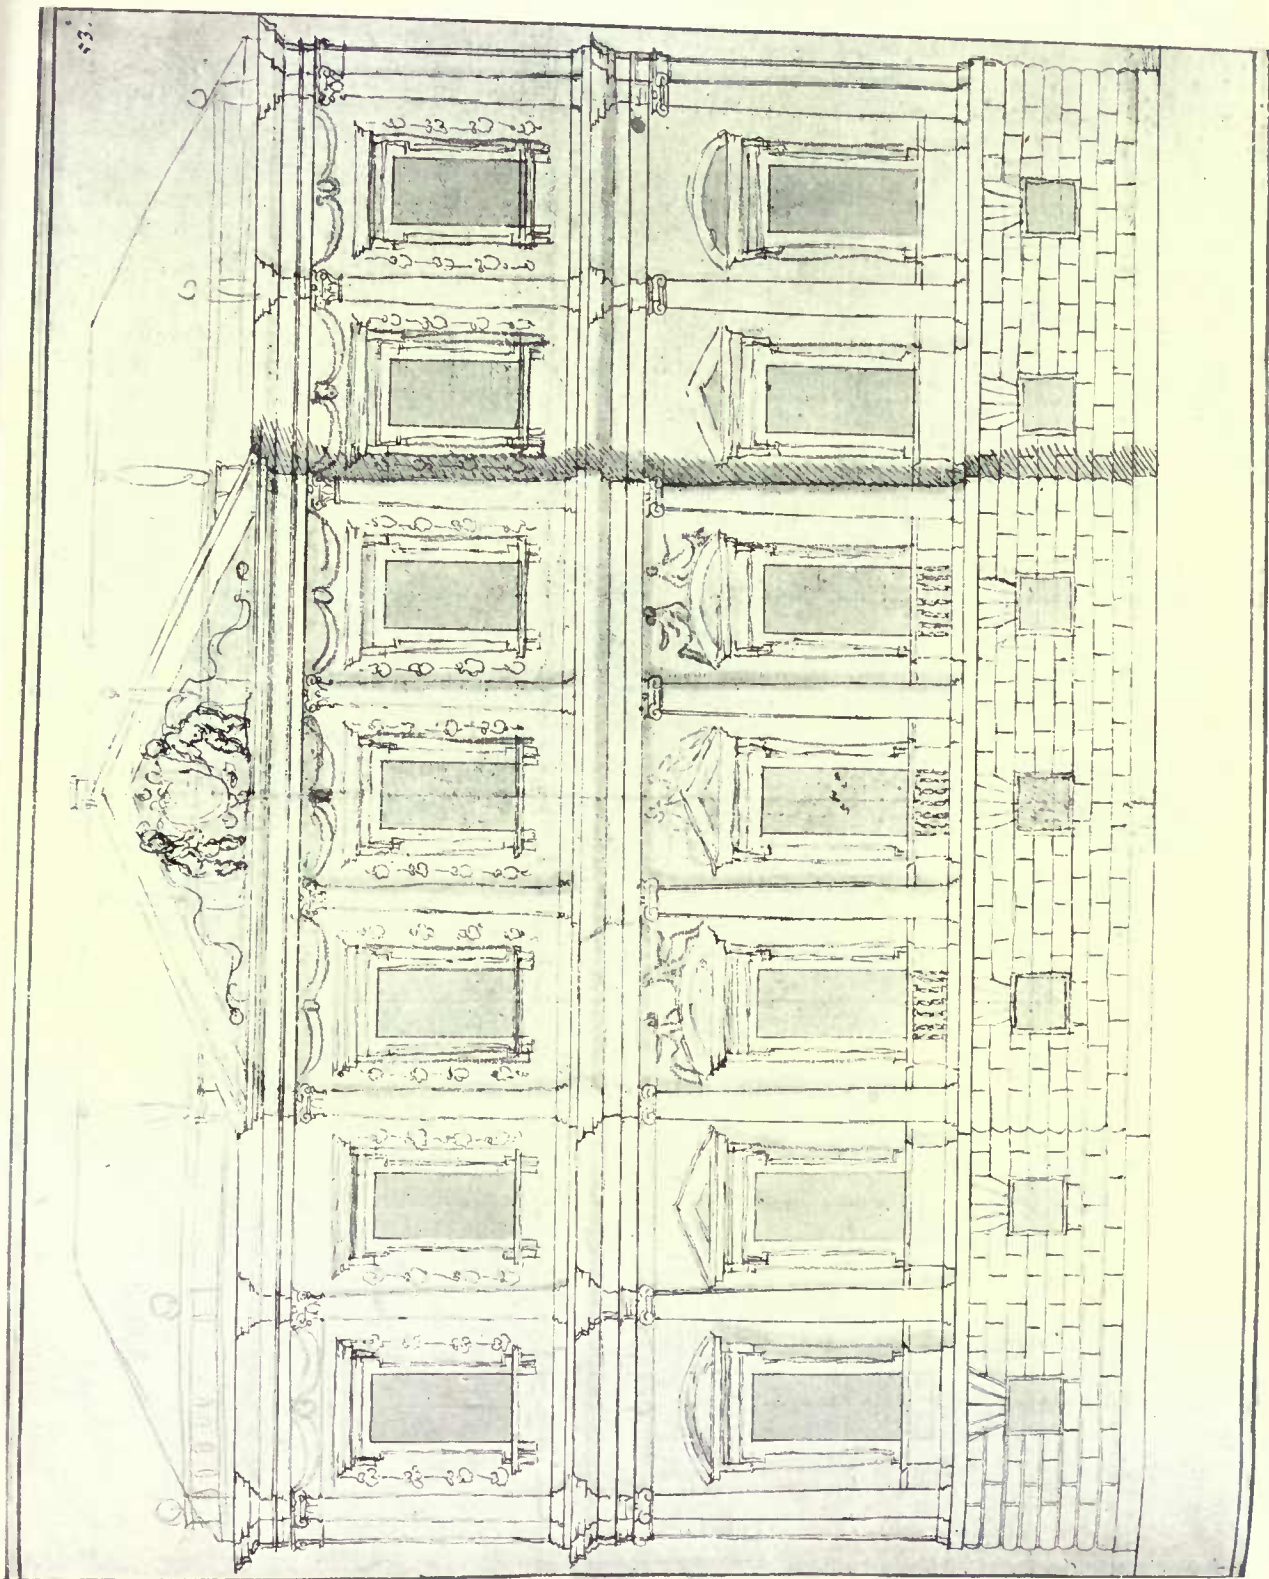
ELEVATION FOR THE EXISTING BANQUETING HOUSE BY INIGO JONES
